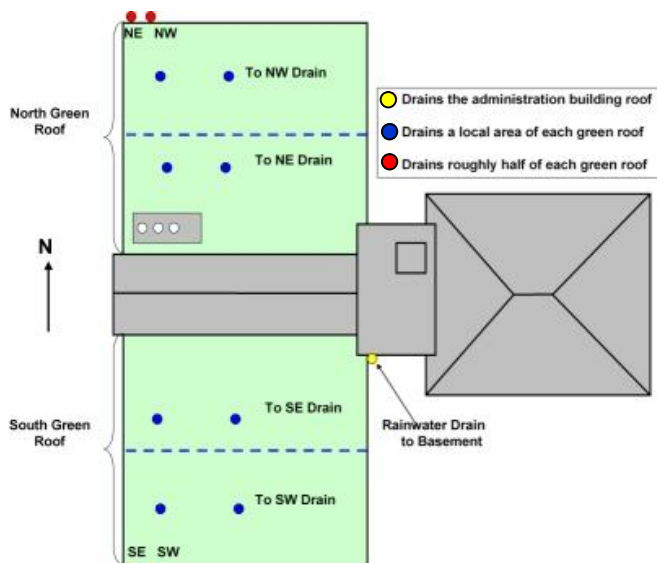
There are two green roof test systems, one on the North Bay, and one on the South Bay. Each of the green roofs has two drainage areas splitting the green roof areas approximately in half. The Office Roof System has gutters that catch runoff from the south and east sides and drains to holding tanks in the basement.
